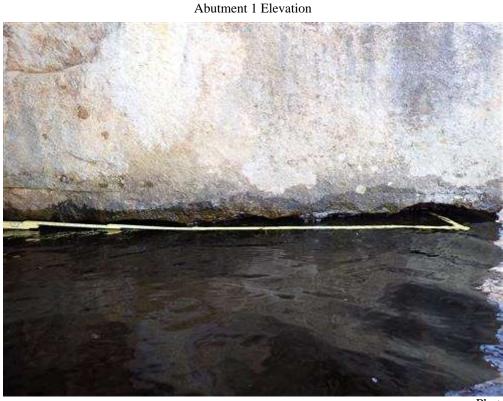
Photo Taken: 04/14/2021 Abutment 1 Left (North) End
